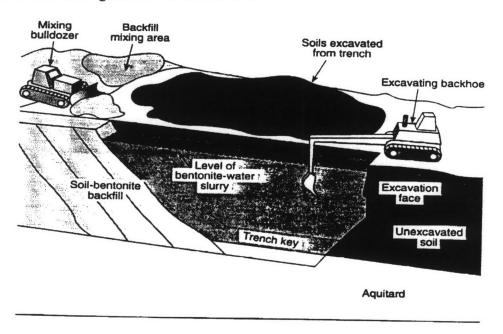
Slurry Wall Construction (from Rumer & Ryan, 1995)
